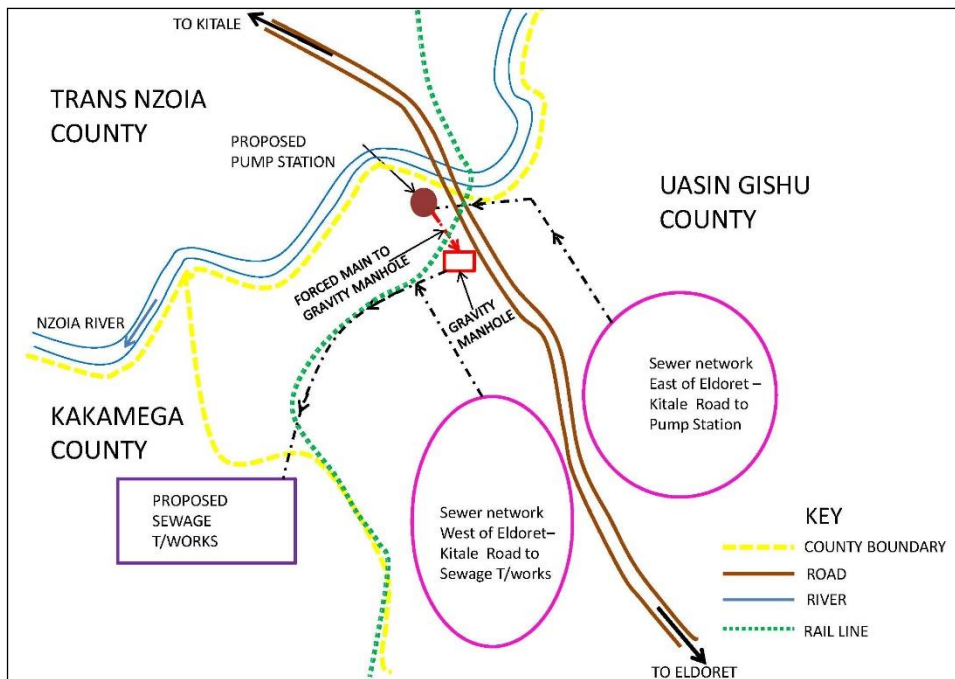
2: Schematic layout of the proposed Moi's Bridge Sewerage System
